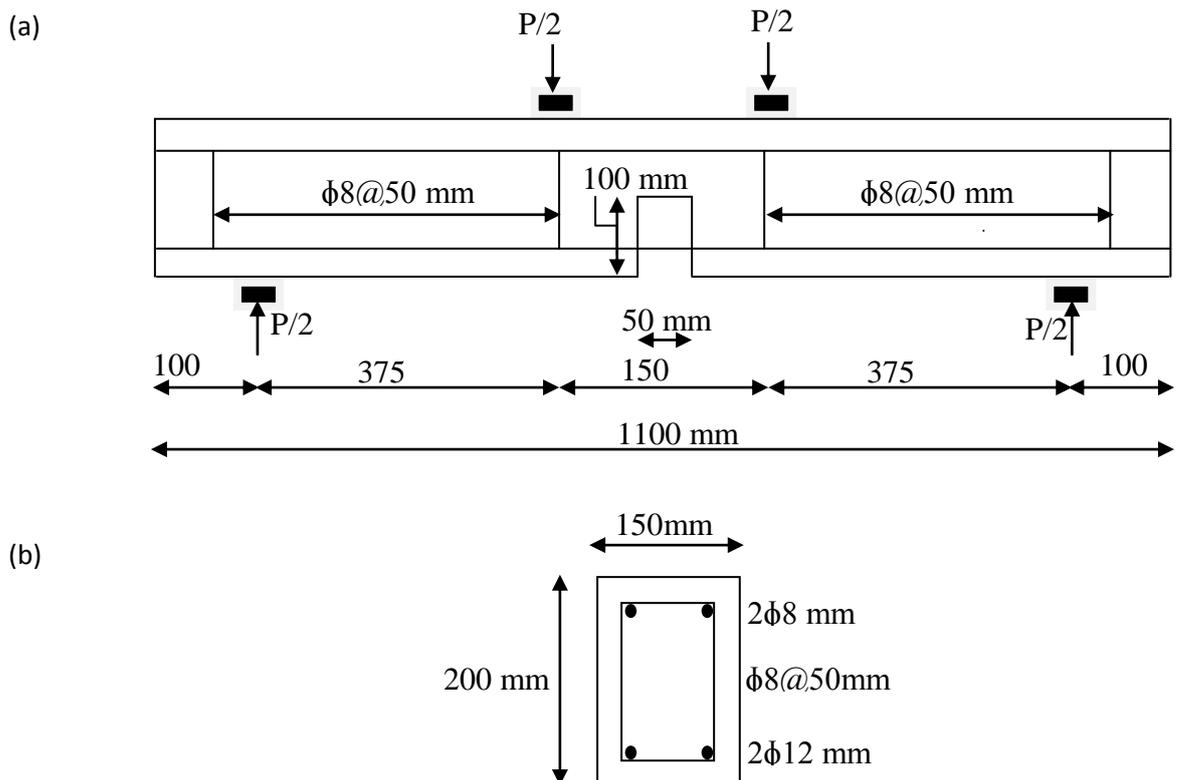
Honeycomb Beam (a) layout and (b) Cross section
